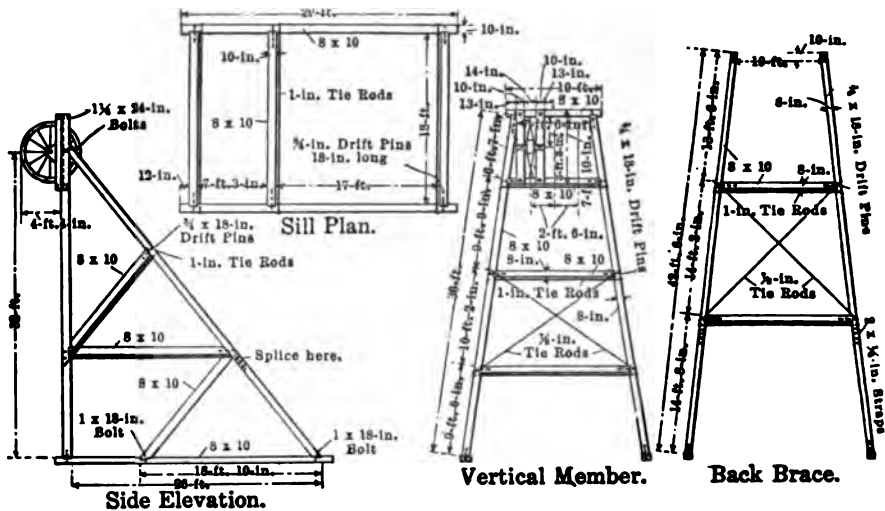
PROSPECT HEADFRAME AT SAND GRASS SHAFT.
